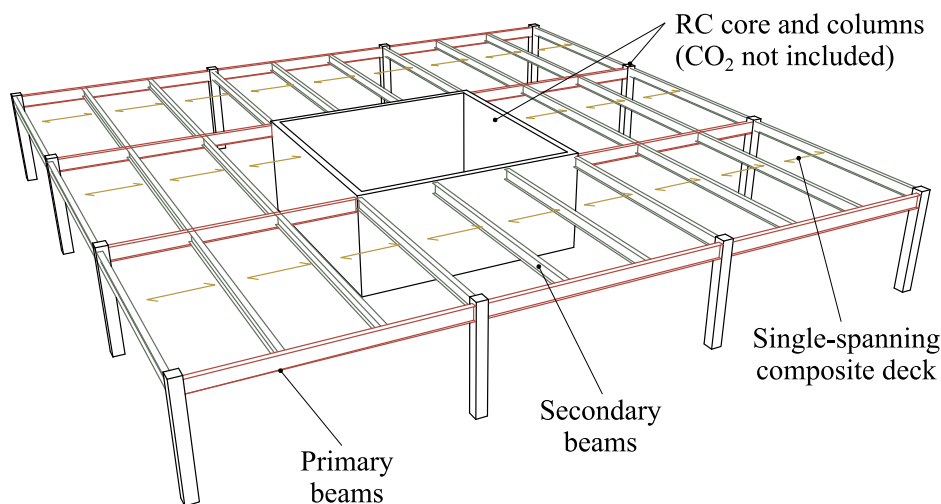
Example layout of structural elements for composite floor designs. Three secondary beams are shown per bay, however this number was varied depending on the span considered.
